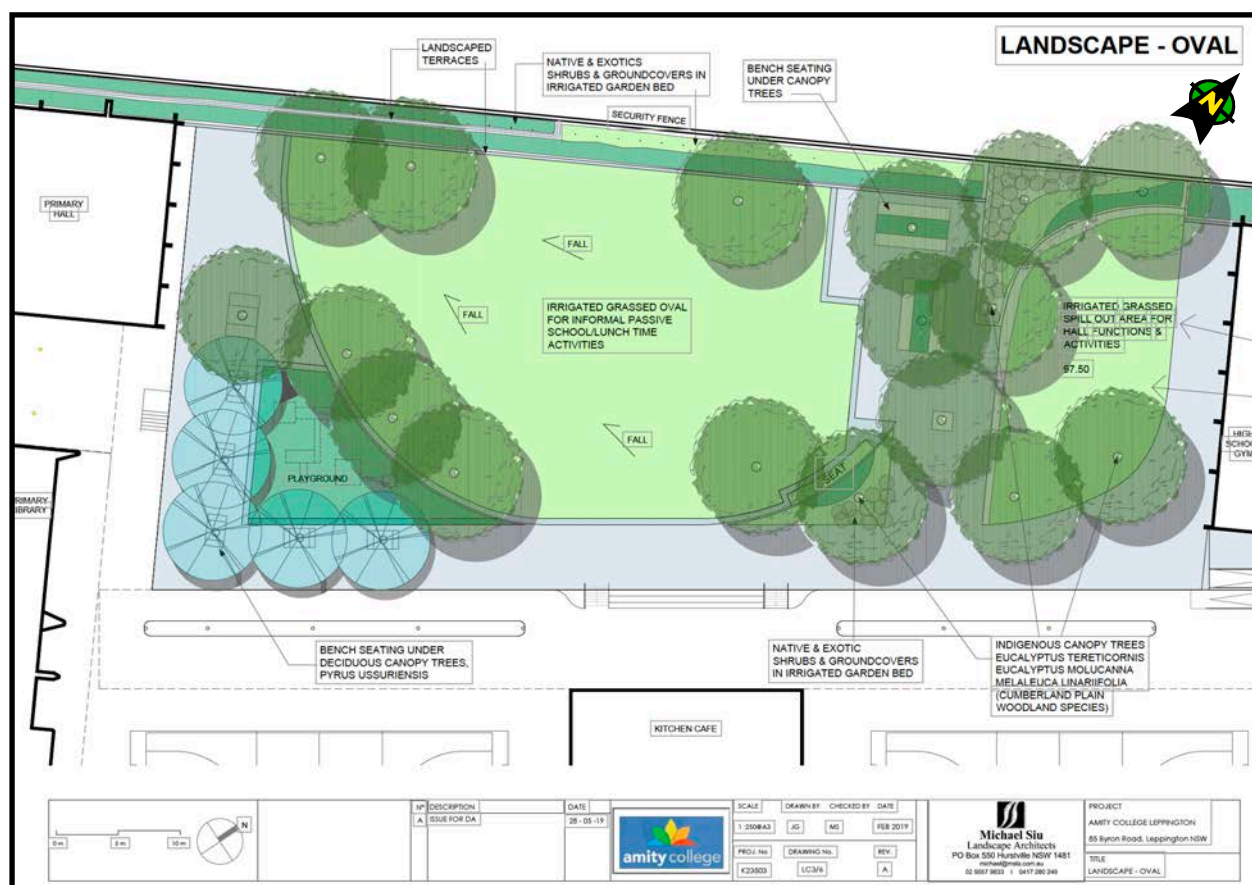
Landscape Plan main playing field (Oval) Amity College Leppington Campus
